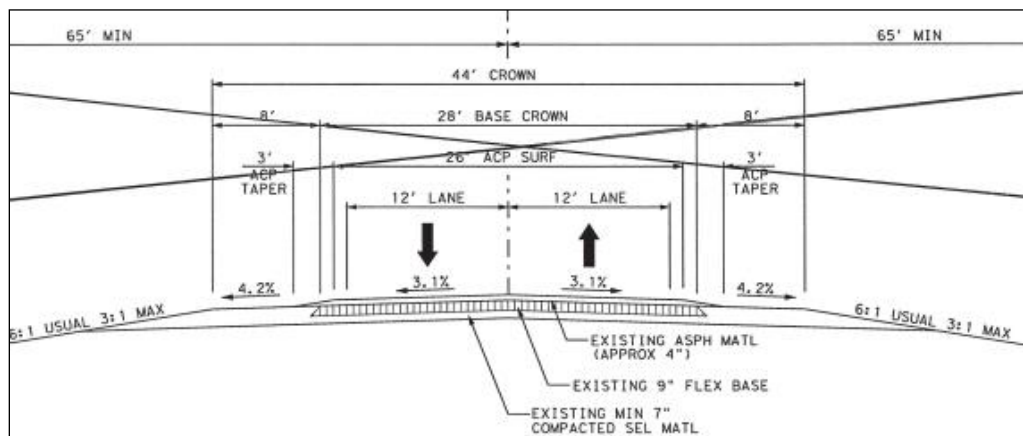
Pre-Construction Existing Typical Section, Project 1.
